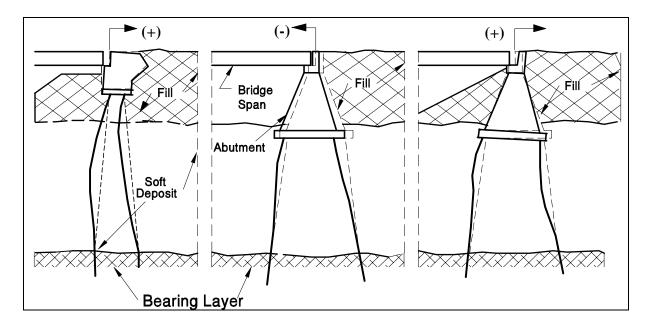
Examples of abutment tilting due to lateral squeeze (FHWA, 2006a).
